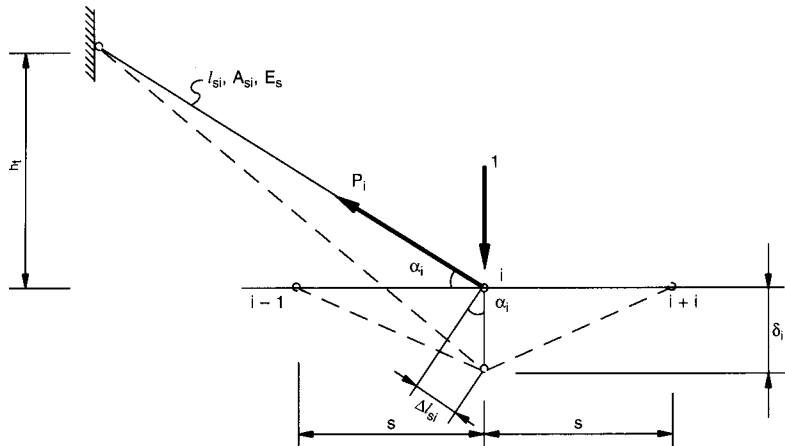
Unit force applied at point of attachment of i th cable stay to girder for determination of spring stiffness.
